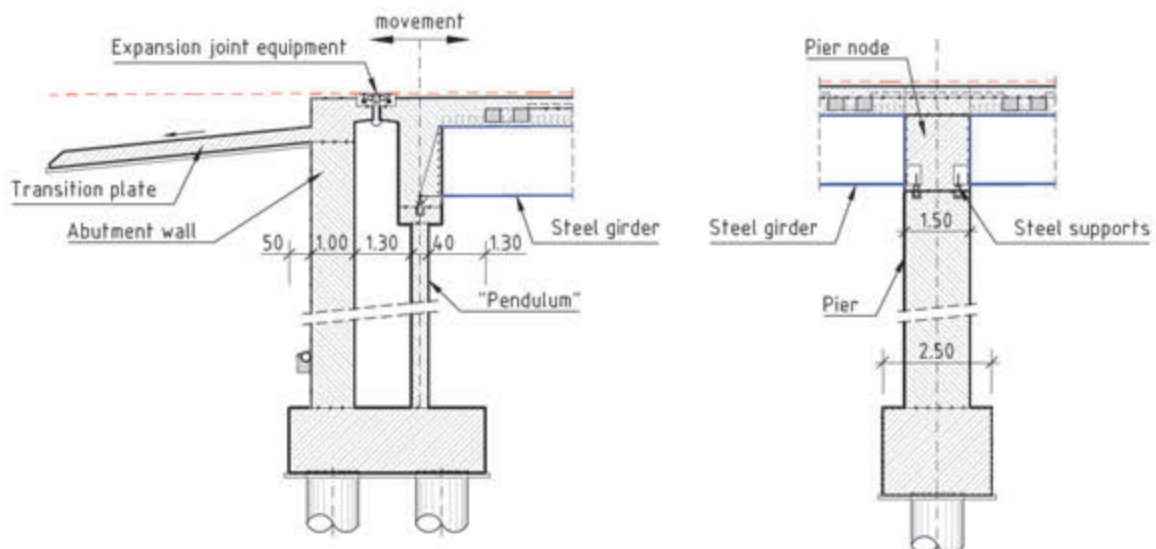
Sub- to superstructure connection: abutment/ pendulum (left) and pier (right) in longitudinal direction
